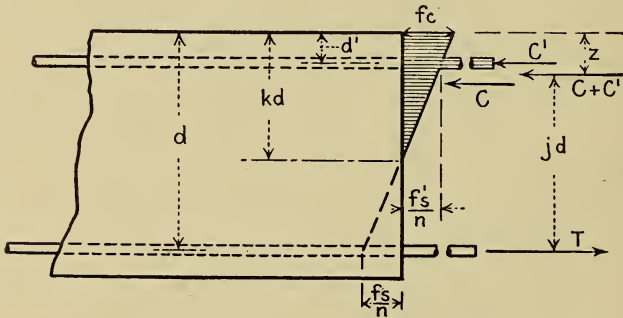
Nomenclature for Concrete Beam Reinforced for Tension and Compression.
